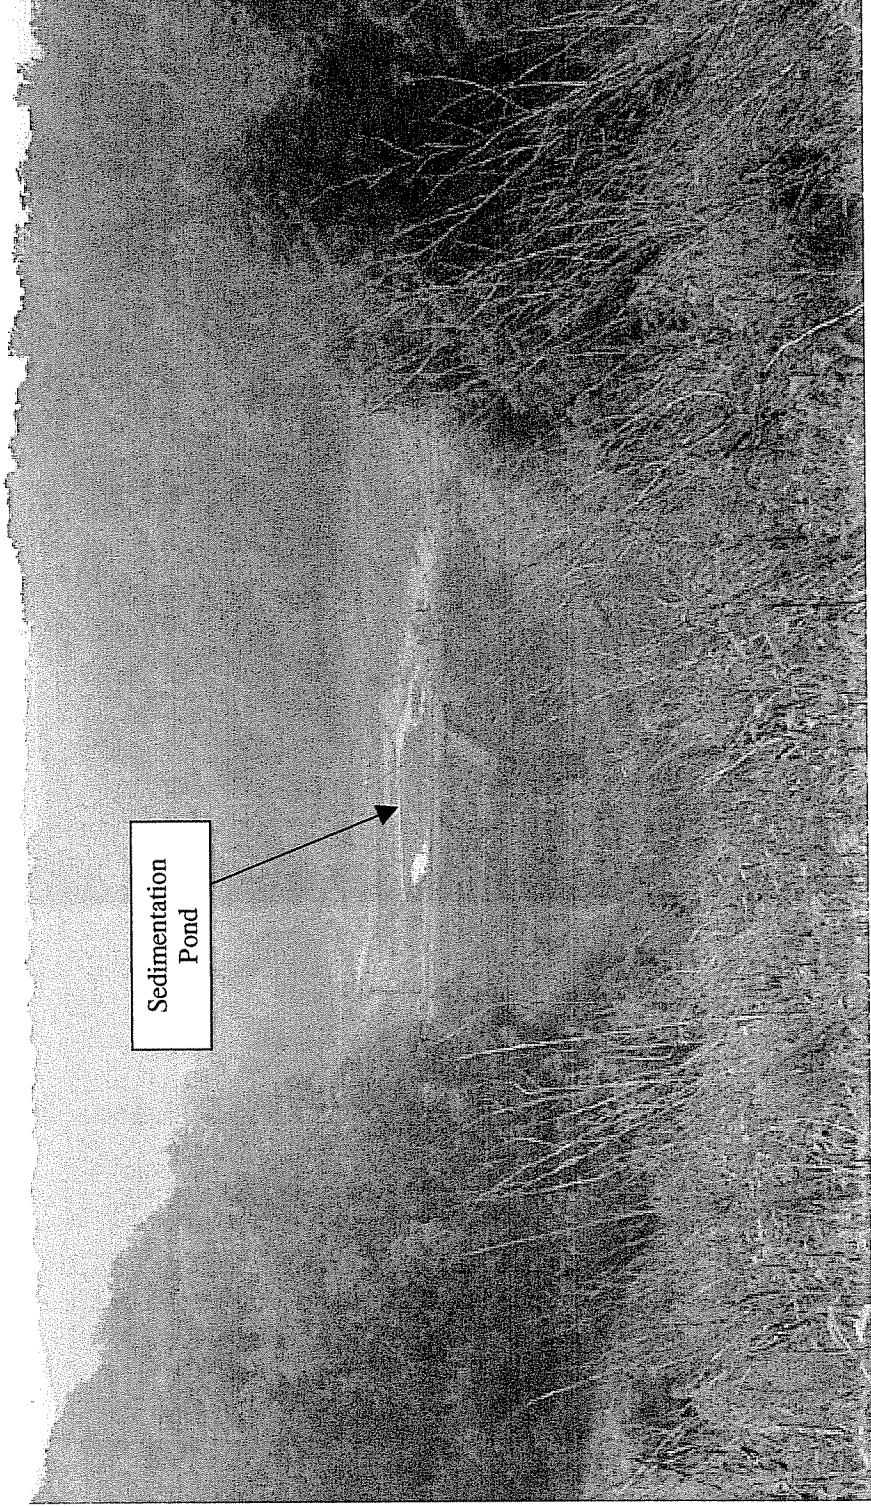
Facing South. Sedimentation Pond Catching Stormwater Runoff from Ash Landfill.
